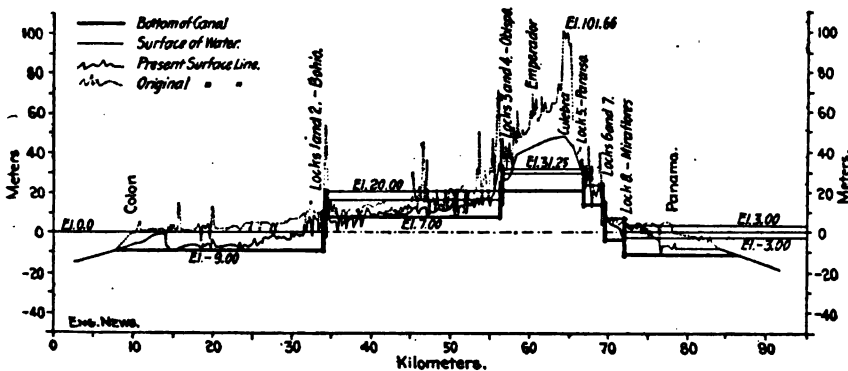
Profile of the Panama Canal; Bottom of Summit Level at Elevation 20.75 metres, or 68.06 feet above Datum.
